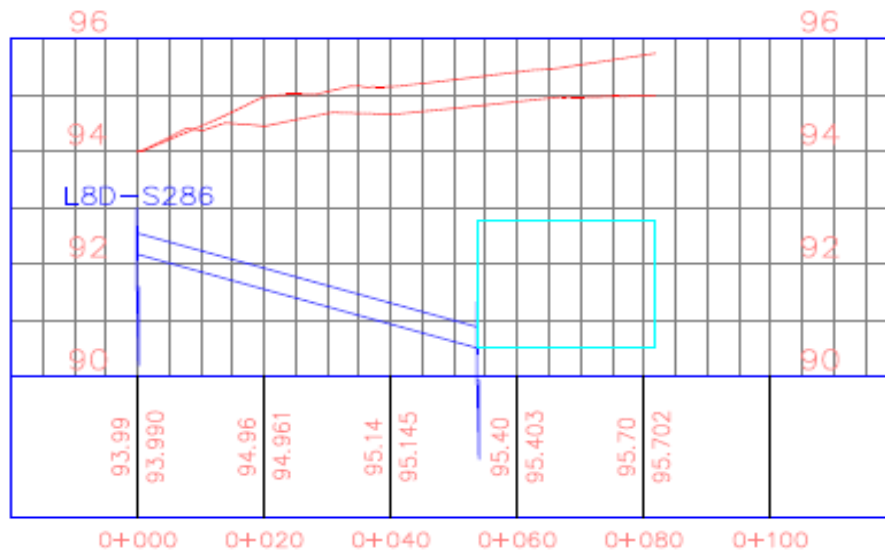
Elevation Profile of 500 mm Intake Pipe at Hampton Place
